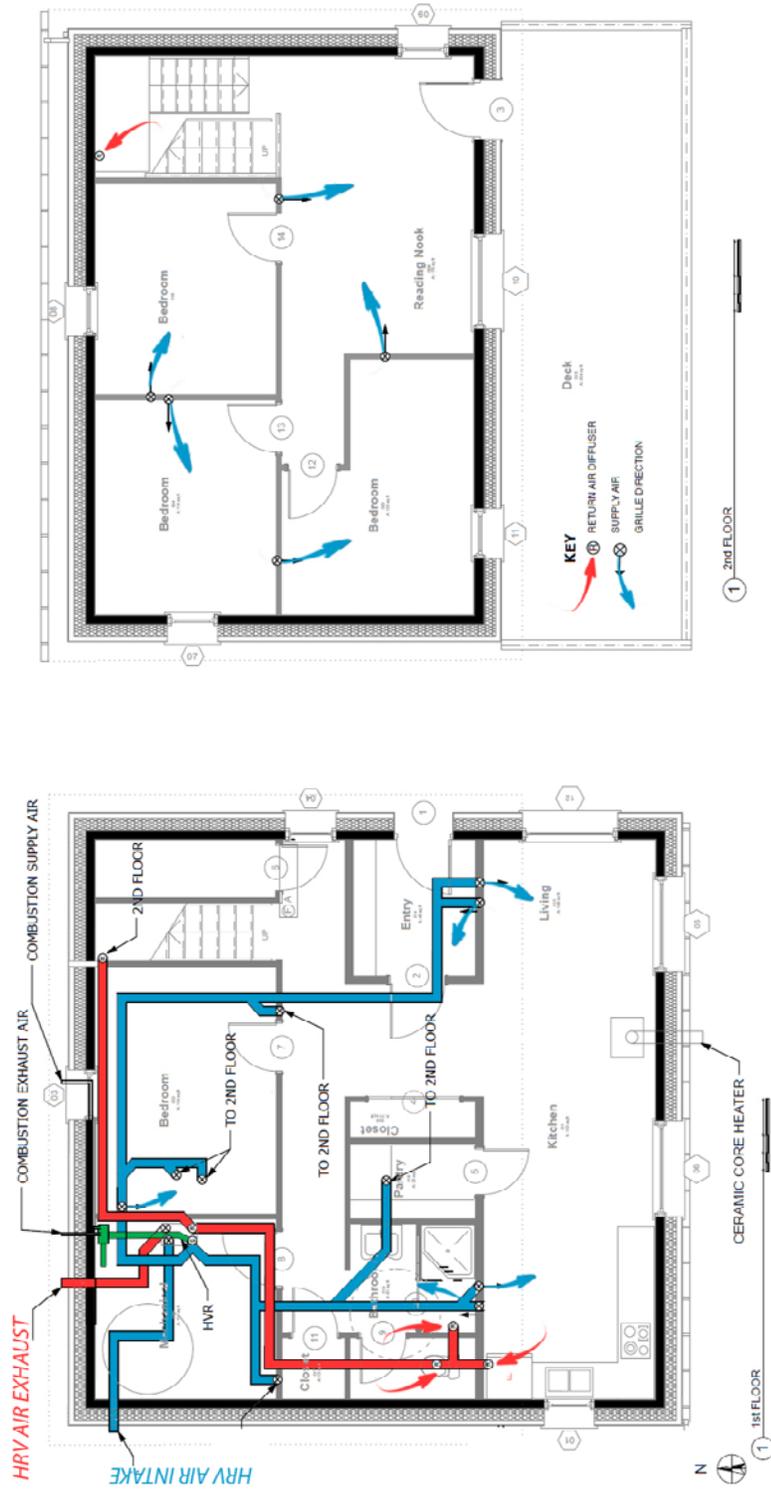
Southwest house ventilation layout. Air is supplied to the bedrooms and main living air (blue arrows). The return vents pull air from the bathroom, hall, and kitchen air (red arrows).
